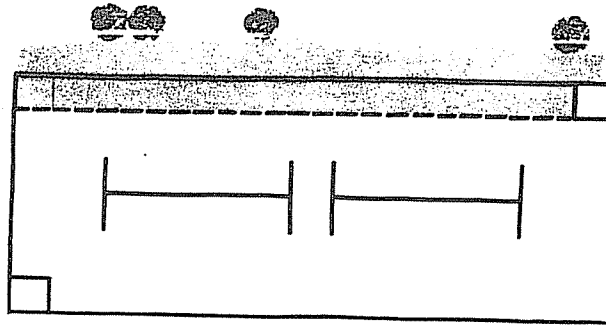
Conceptual plan of east-west, half-block parking structure featuring retail area at first level
